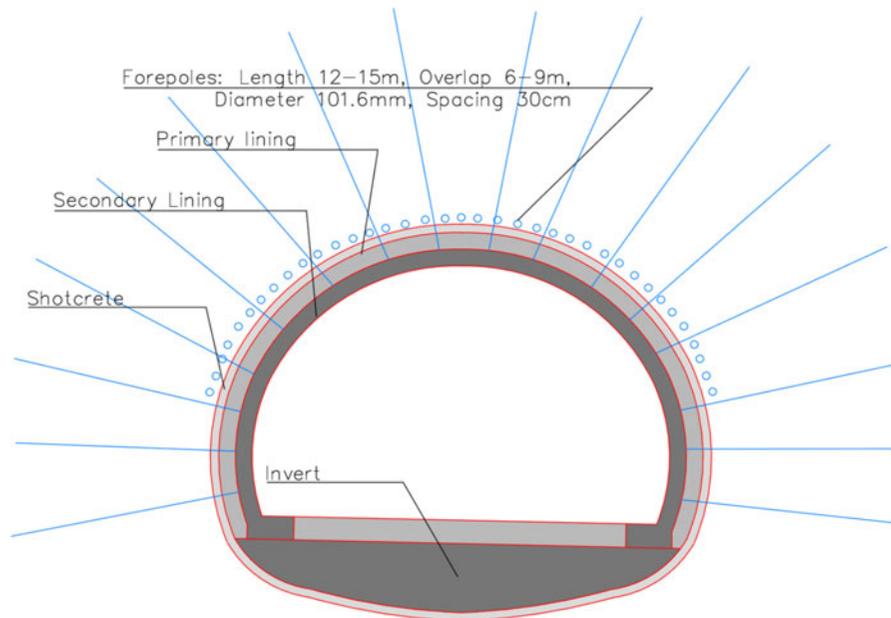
Details of cross section of the Golovec tunnel (modified after Bizjak and Petkovsek 2004)
